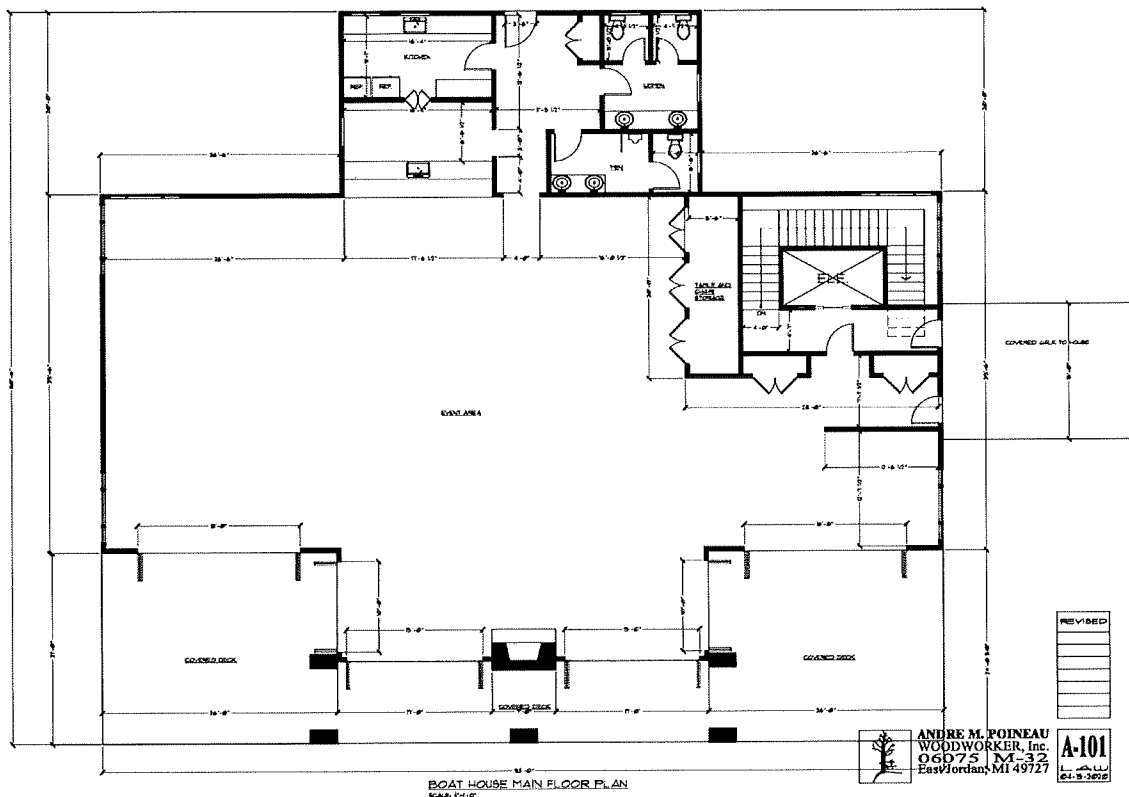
, from Exhibit L, Bates # 164. (printed from uploaded Joint Permit, EGLE.)
